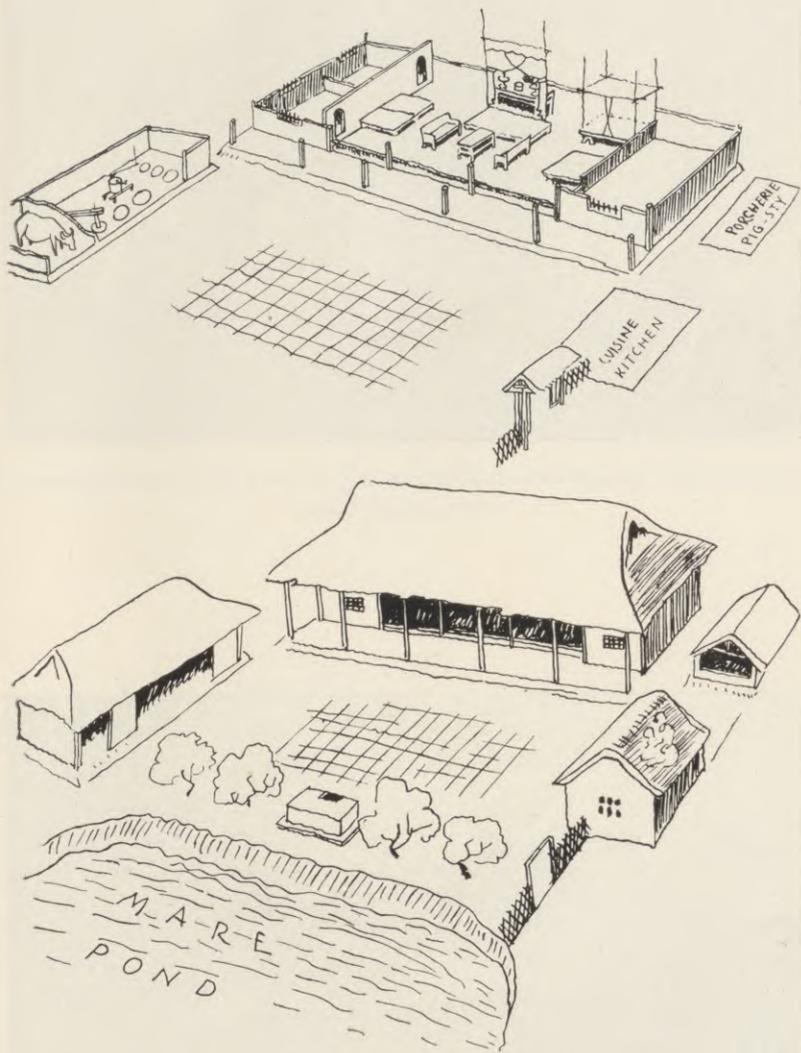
Perspective plan and elevation of the house of a well-to-do Annamite peasant.
